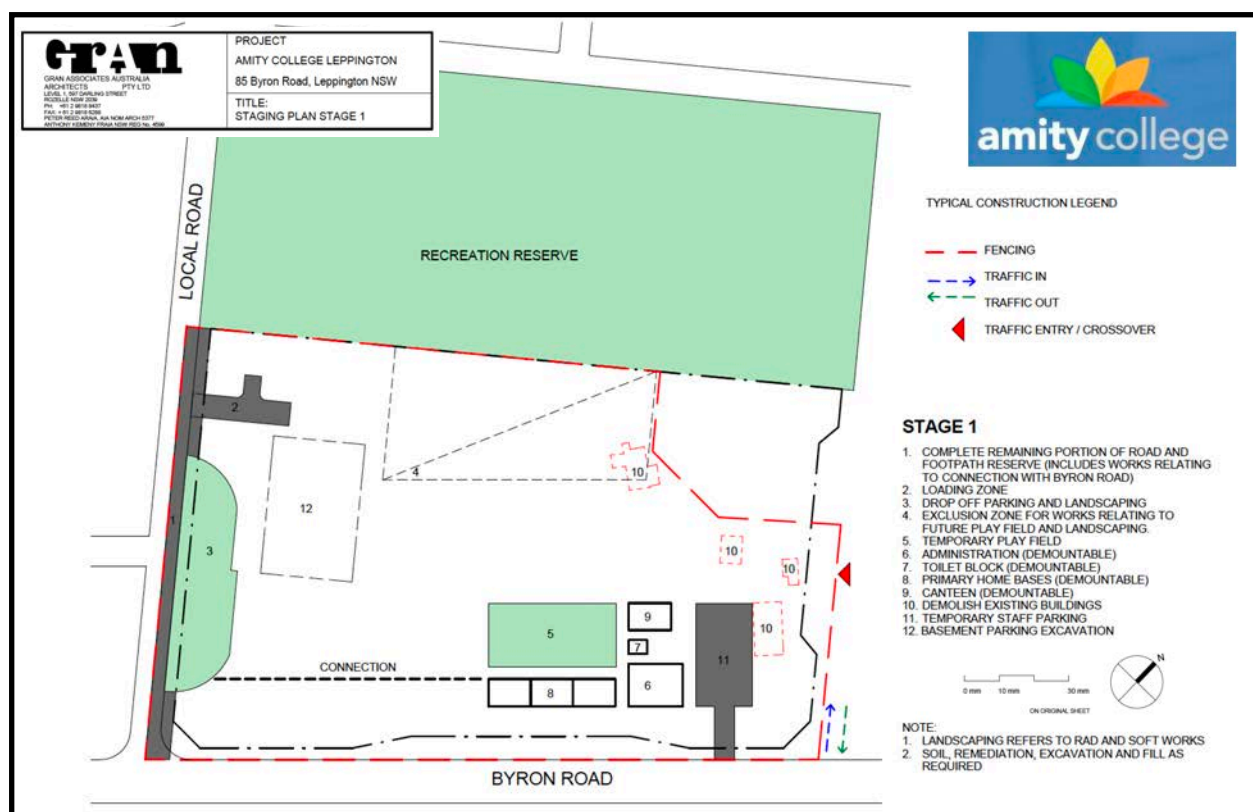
Proposed Stage 1 of Amity College school campus- Primary School
